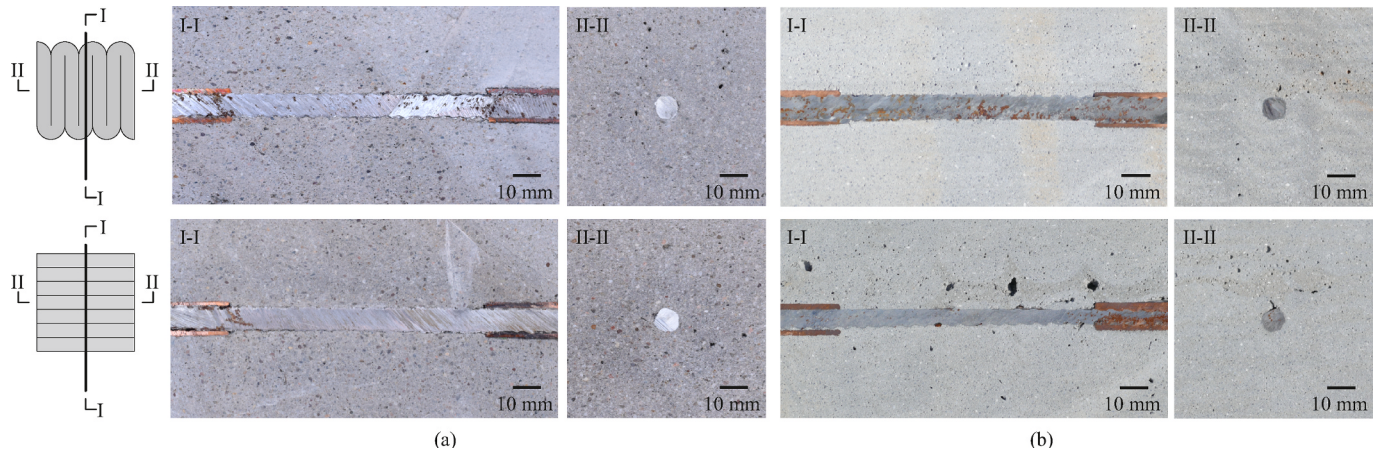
Sections through the reinforcing bar in untested specimens (top: parallel configuration; bottom: perpendicular configuration): (a) UniNa; (b) ETHZ.
